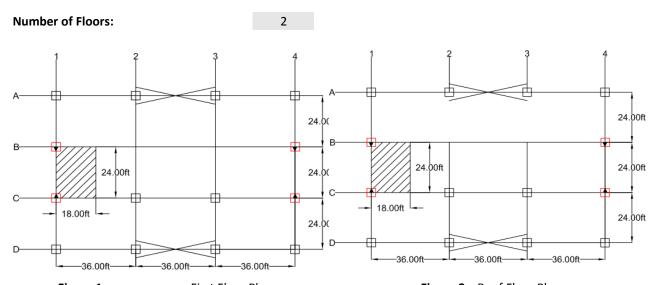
First Floor Plan Figure 2 - Roof Floor Plan
